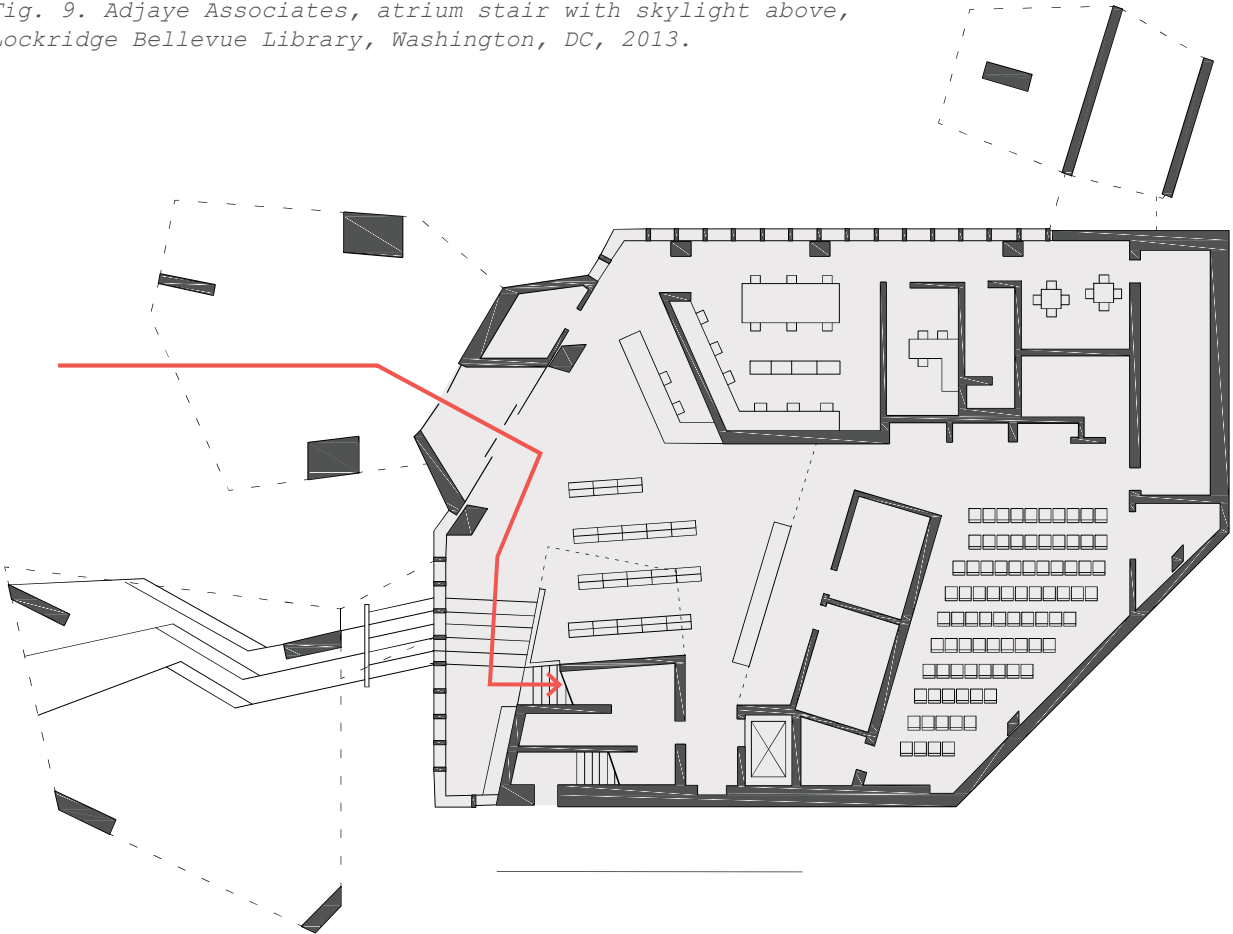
Adjaye Associates, first floor plan, Lockridge Bellevue Library, Washington, DC, 2013.
